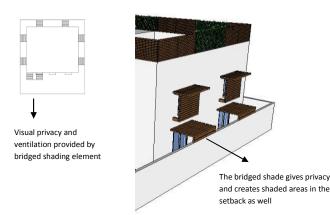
Adding bridged shading above windows on the ground floor in an existing condition. The shading element has to provide privacy and should allow breeze. (Source: the author)
